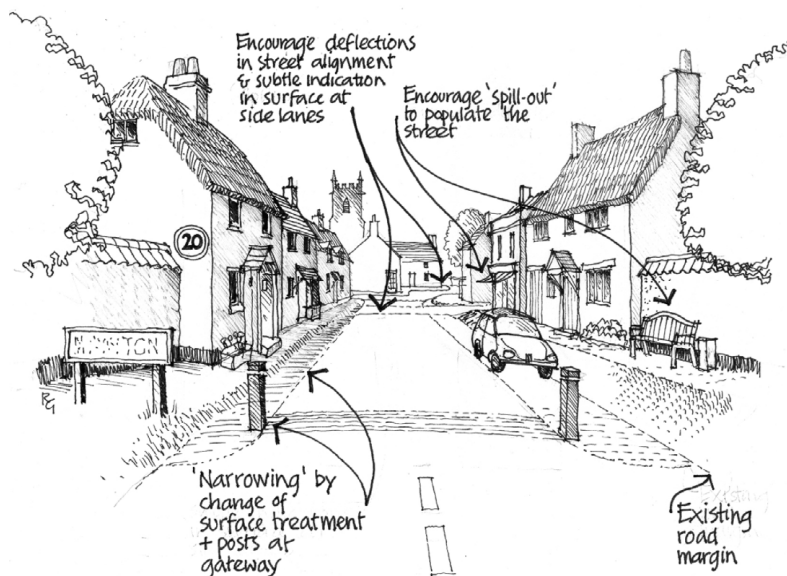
Typical 'Gateway' design recommendation from Traffic in Villages
